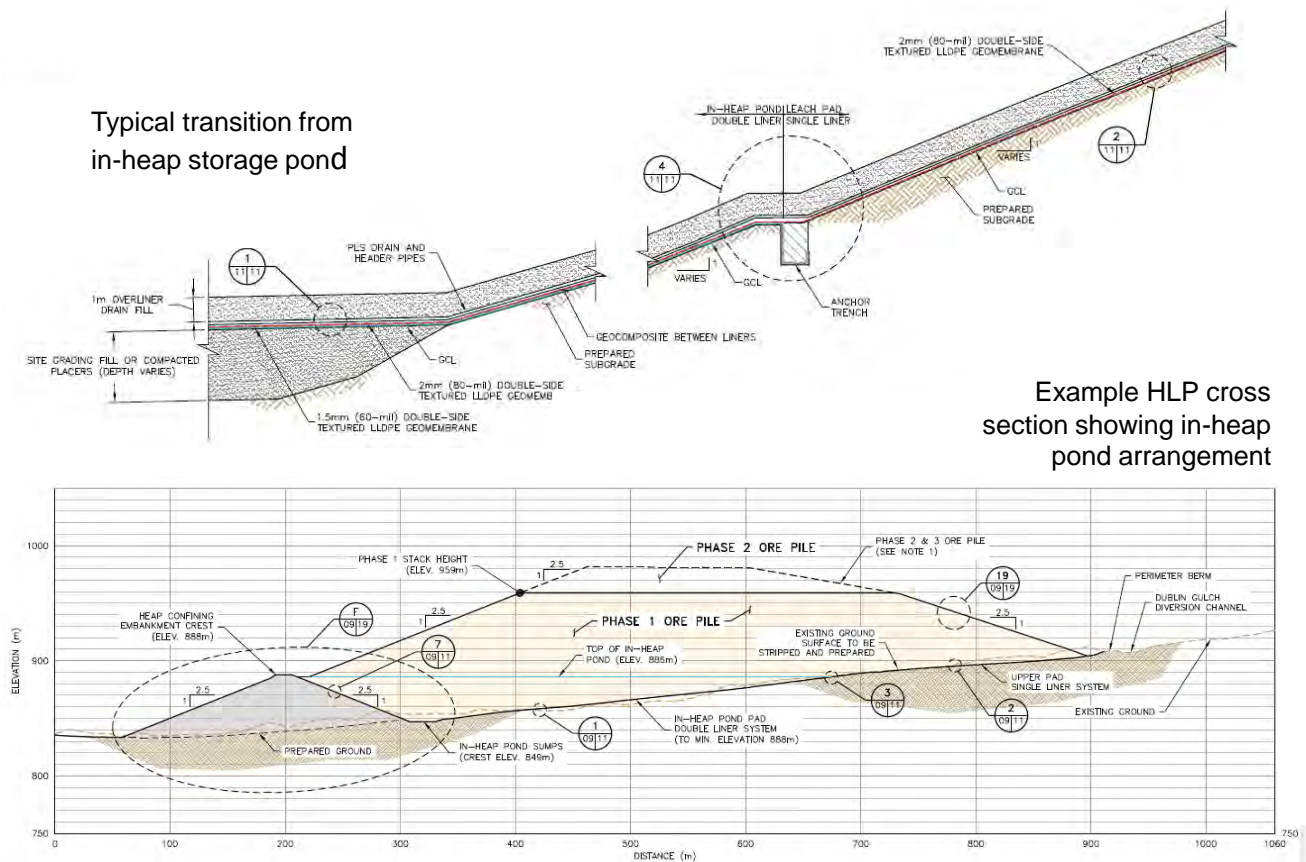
Example HLF Cross-Sections, Showing Typical Transition and In-Heap Pond Arrangement
